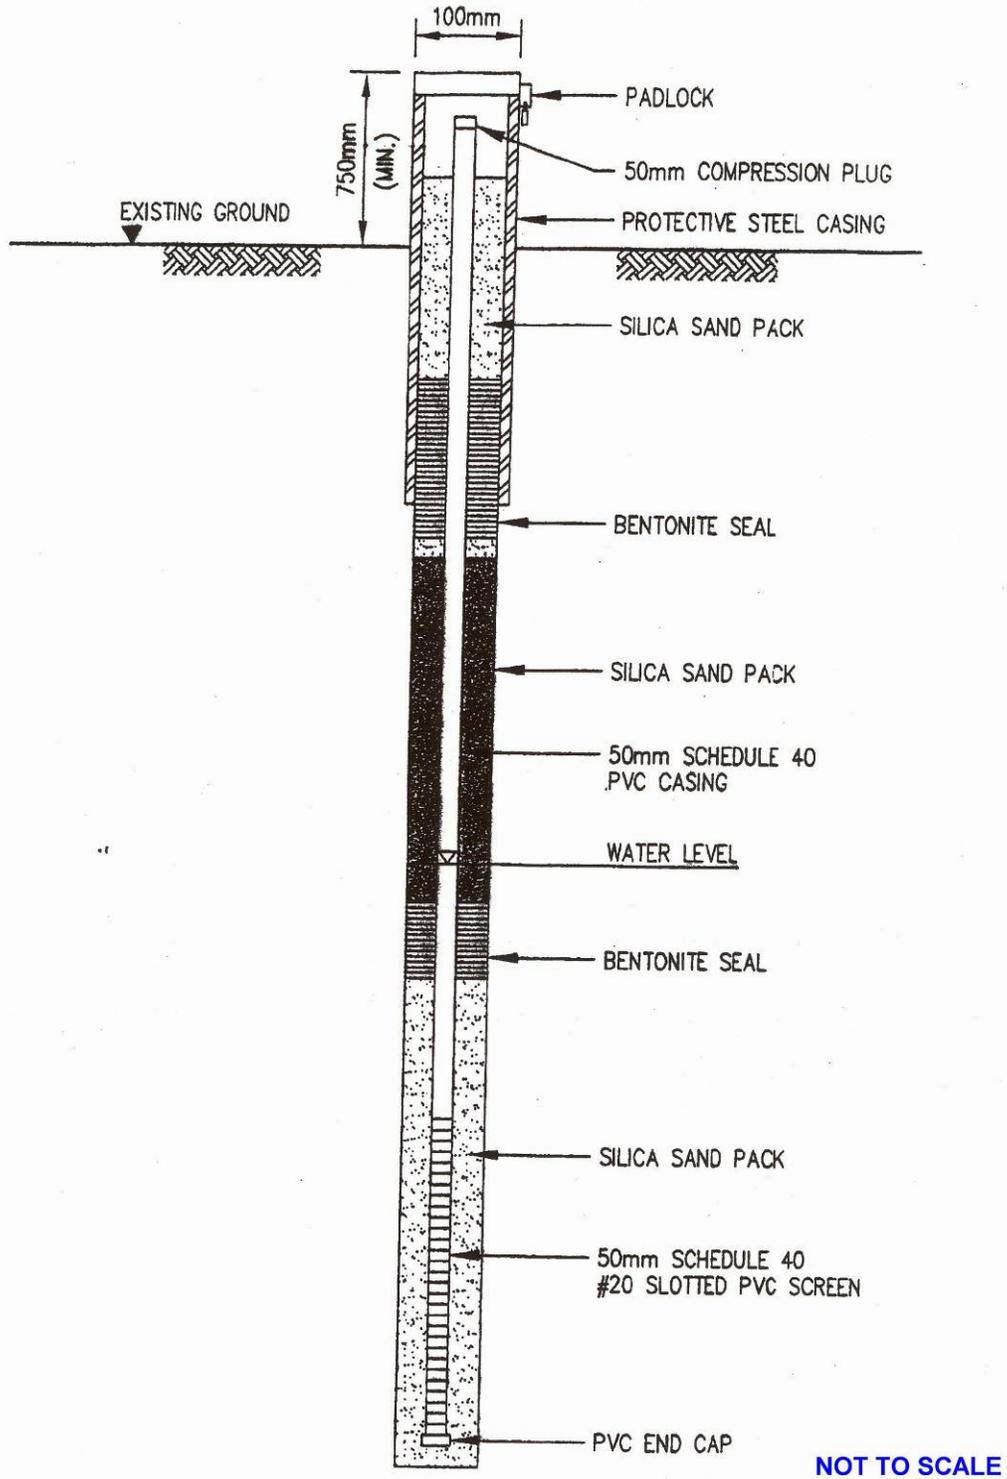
Typical Monitoring Well Construction Recommended For the Site
